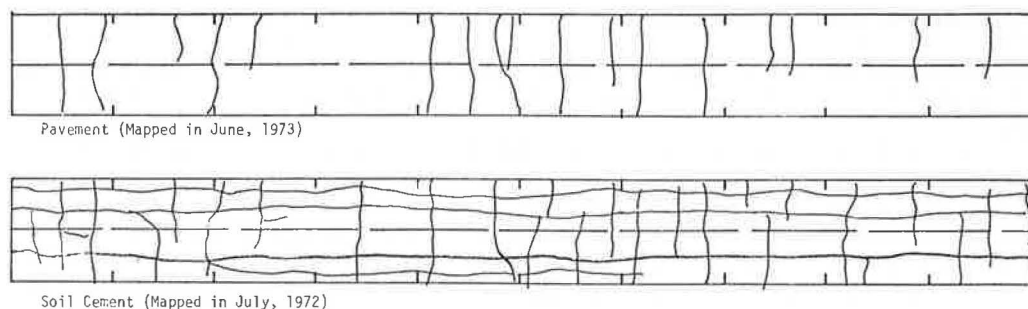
Cracking pattern of soil-cement base and superimposed pavement for experimental section with less cement and increased thickness.
